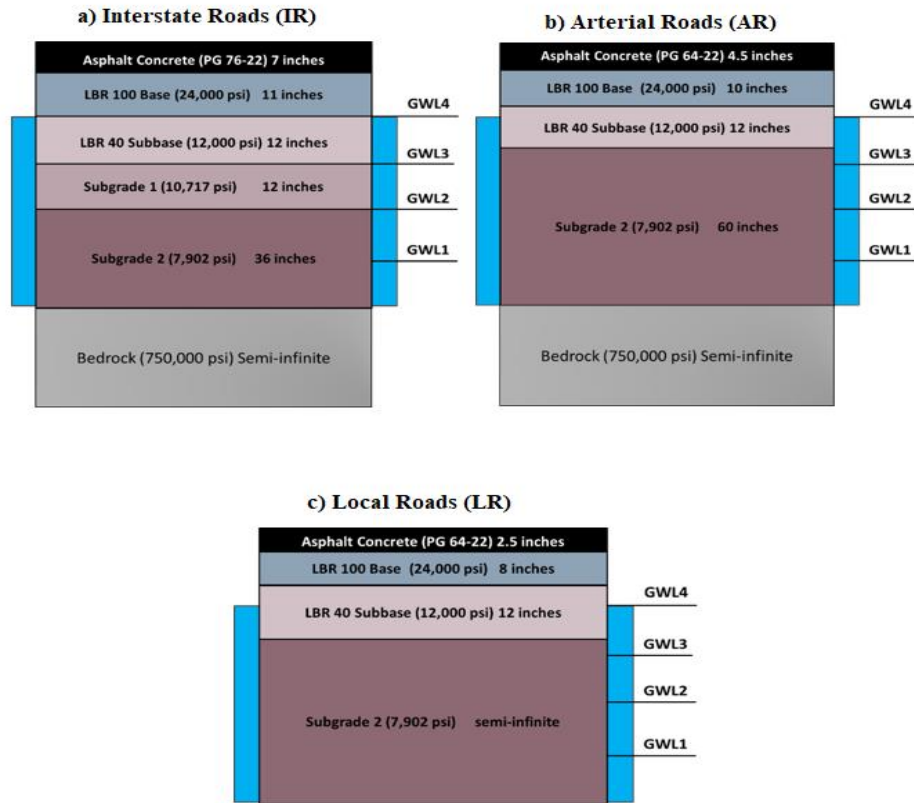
Pavement Cross-Sections with Selected Groundwater Table Levels for The Mechanistic-Empirical (ME) Pavement Analysis: a) IR Cross-Section, b) AR Cross-Section c) LR Cross-Section
